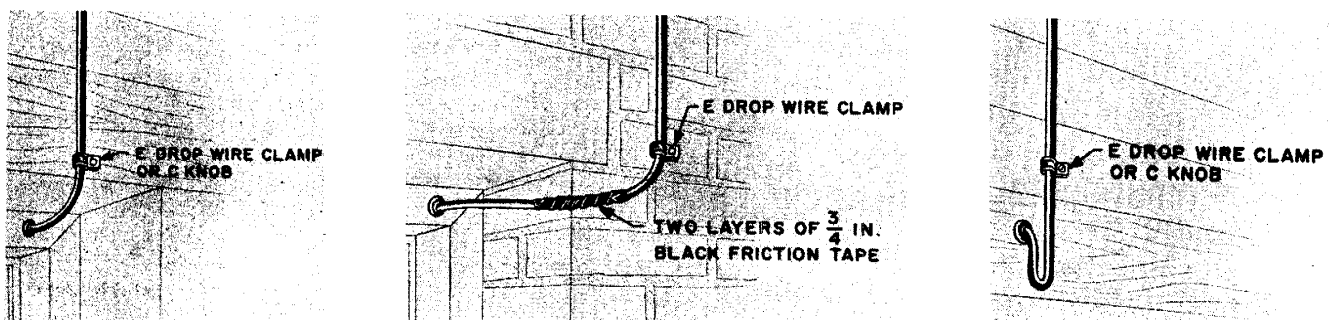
Last Attachment, Building Entrance Slopes Upward from Outside
